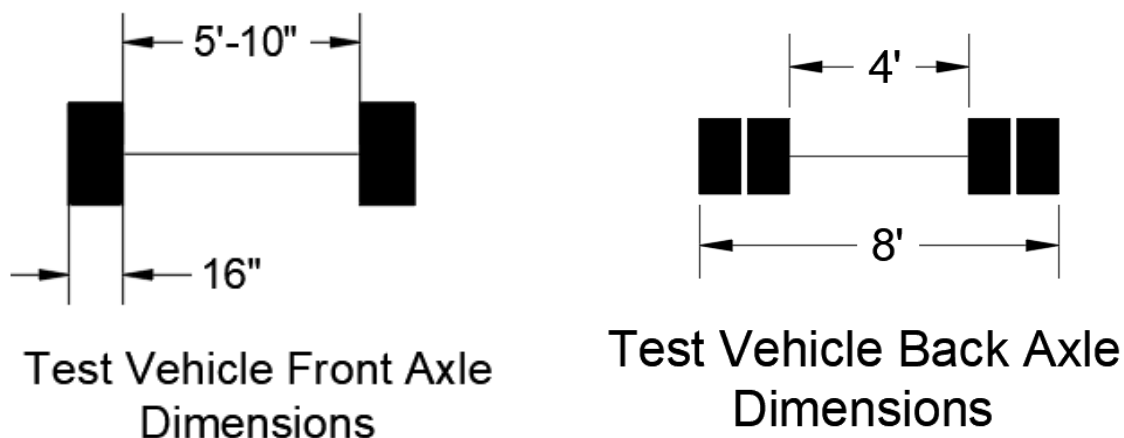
Load Test Vehicle Axle Dimensions for 1<sup>st</sup> Yutan Bridge Load Test
